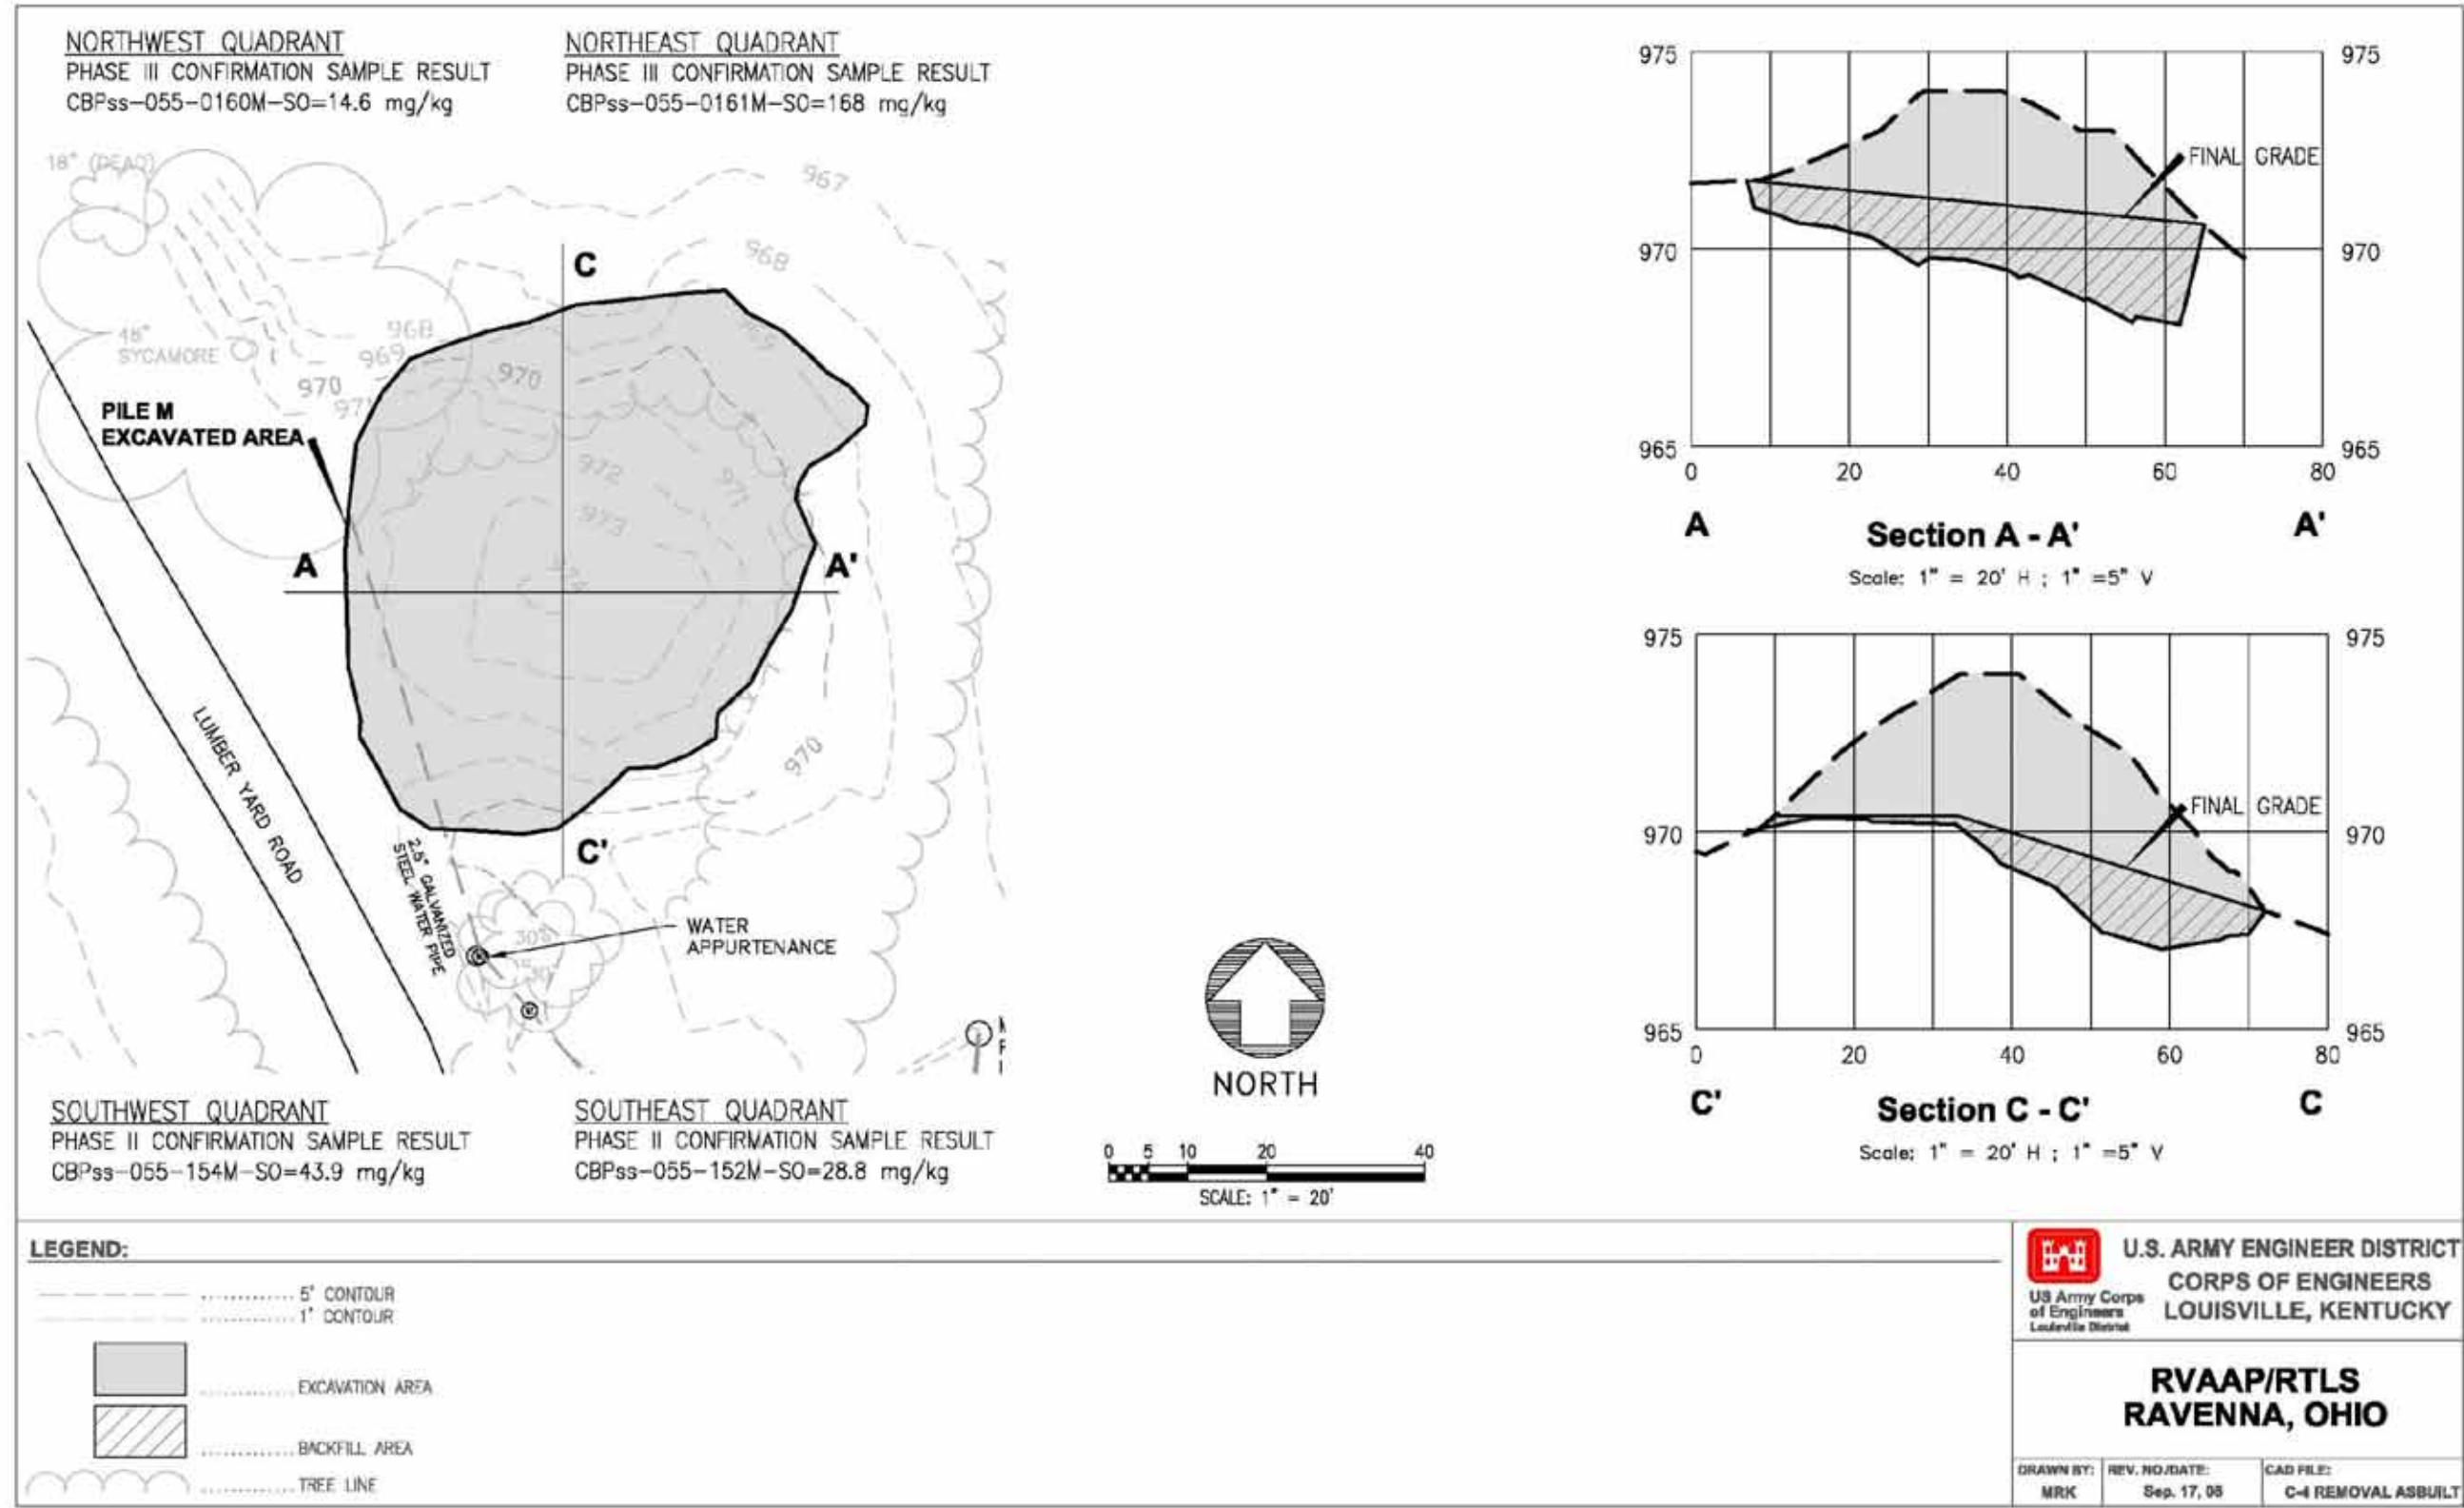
Pile M Final Excavation Area (Plan and Profile View)
